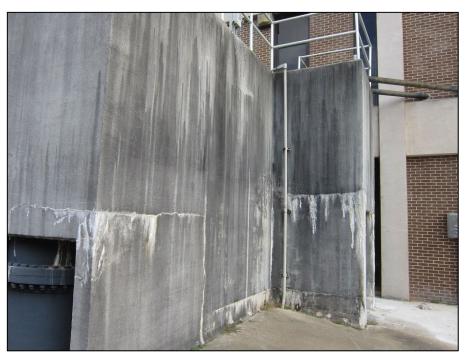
Observed Cracking in Basin Walls; No Apparent Expansion Joints at Millwood WTP
